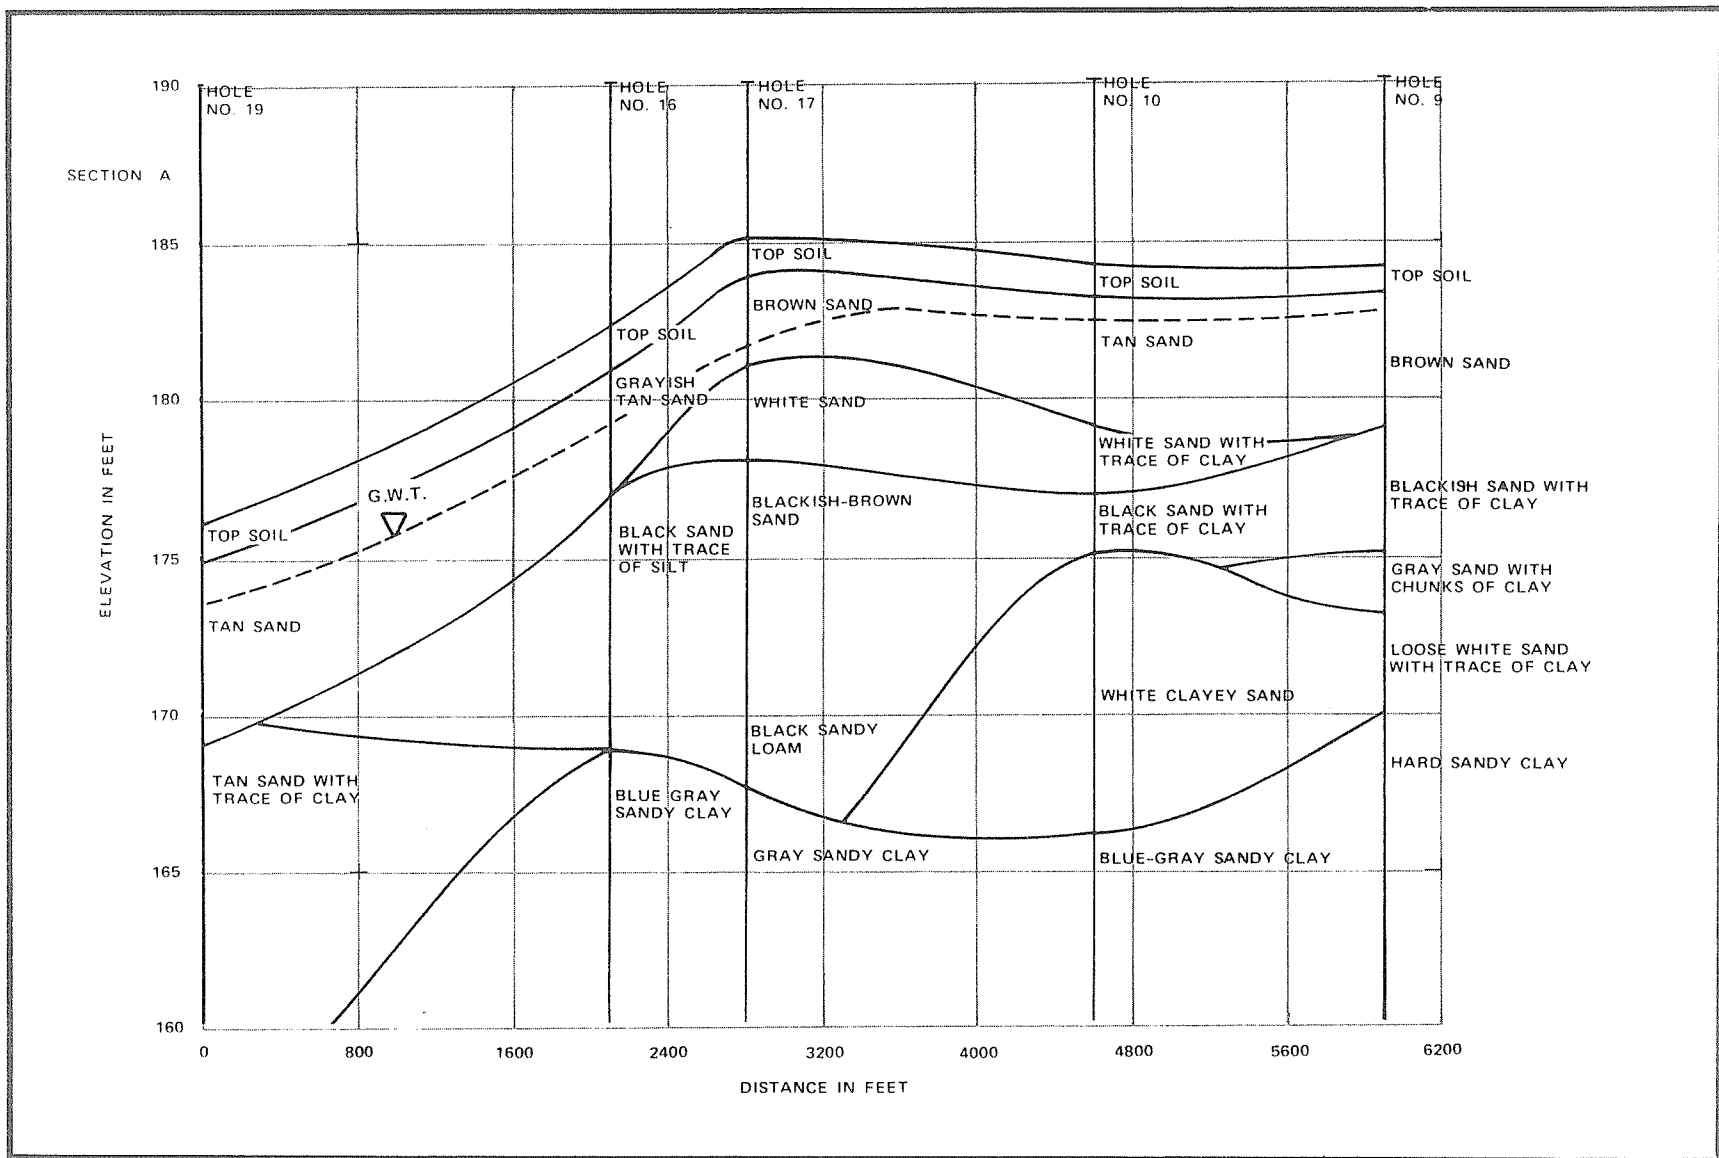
INFERRED STRATIFICATION IN SELECTED CROSS-SECTIONS OF DEERHAVEN SITE.
